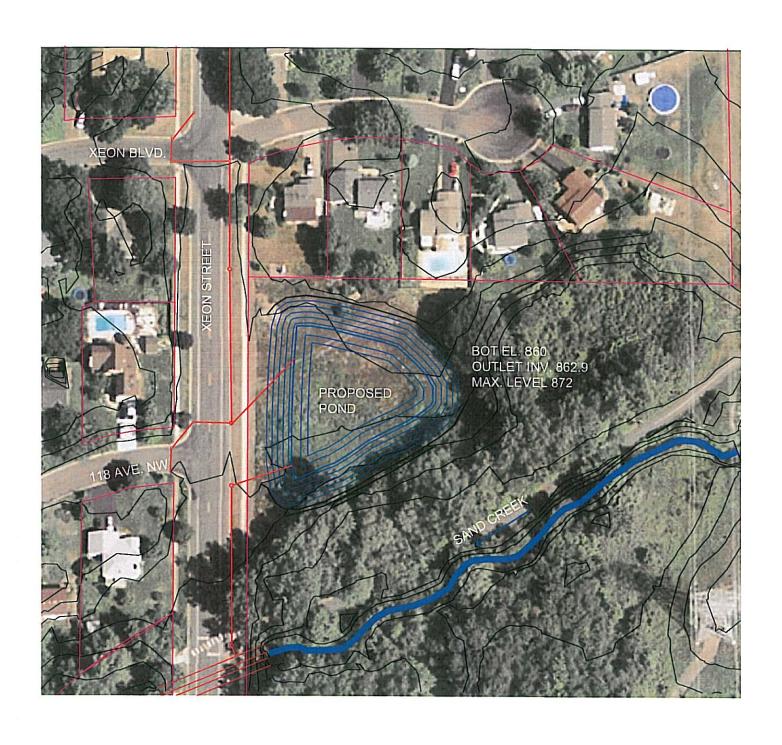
PROPOSED CONDITIONS XEON STREET POND
